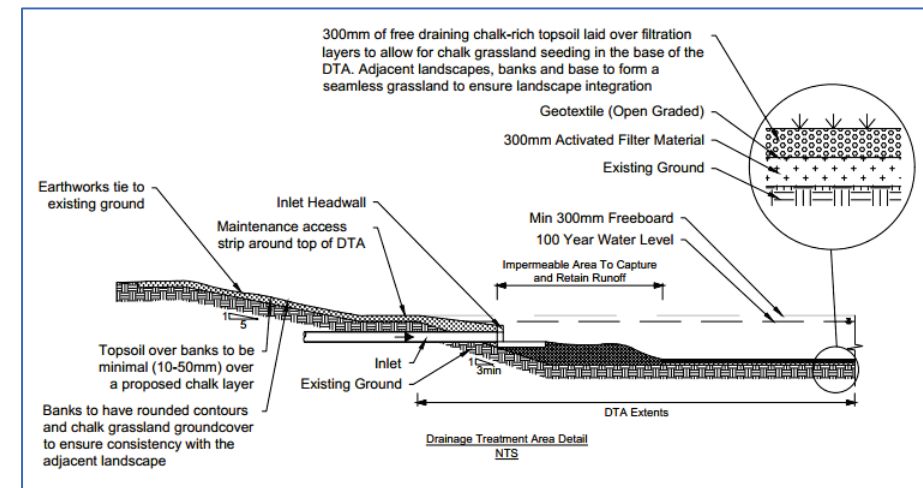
DTA Typical Cross Section (Infiltration)
